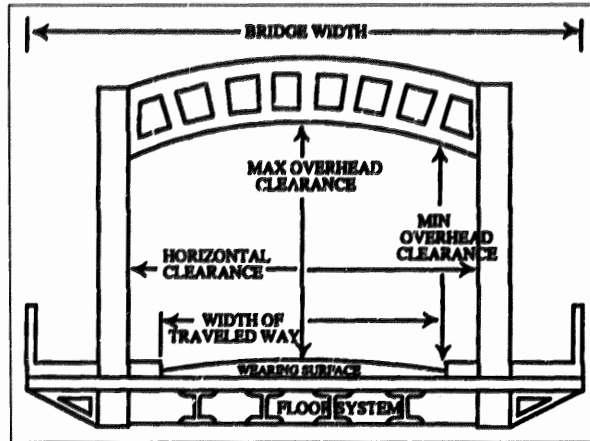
Cross-section of a bridge superstructure showing components and measurements
